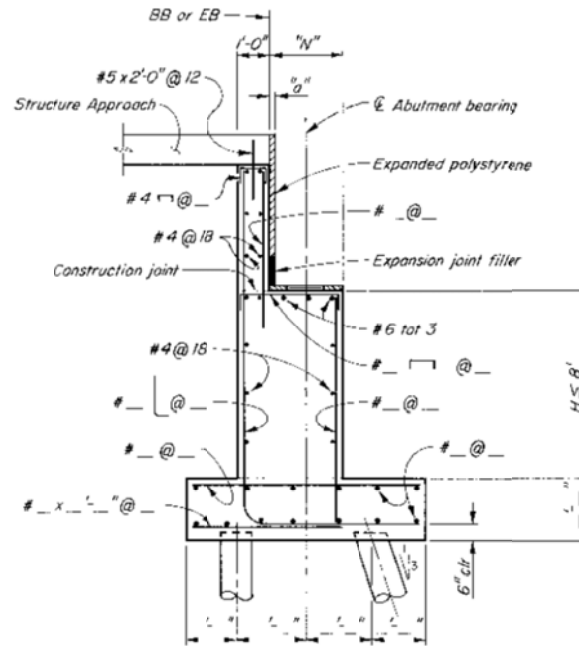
Standard details for seat type abutments (BDA, 1988)
